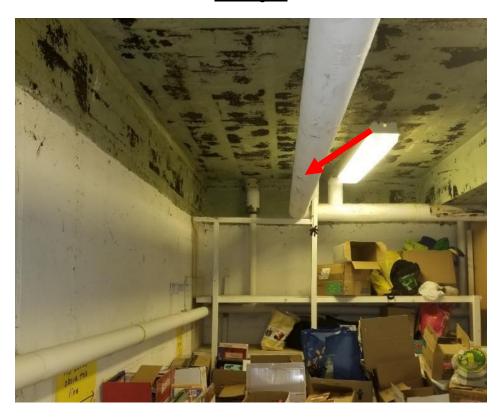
Basement, craft drying room, <1 linear metre fair condition Aircell on pipe running east to west in center of room.
